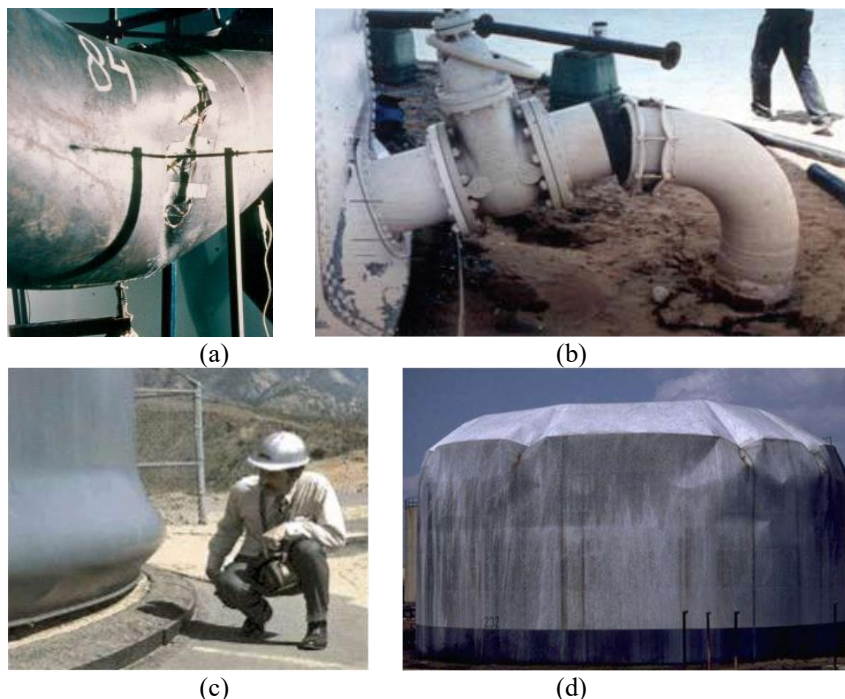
(a) effect of local buckling in a pipe [6], (b) failure of pipe-to-tank connection [18], (c) elephant's foot buckling [6], (d) roof damage [6]
